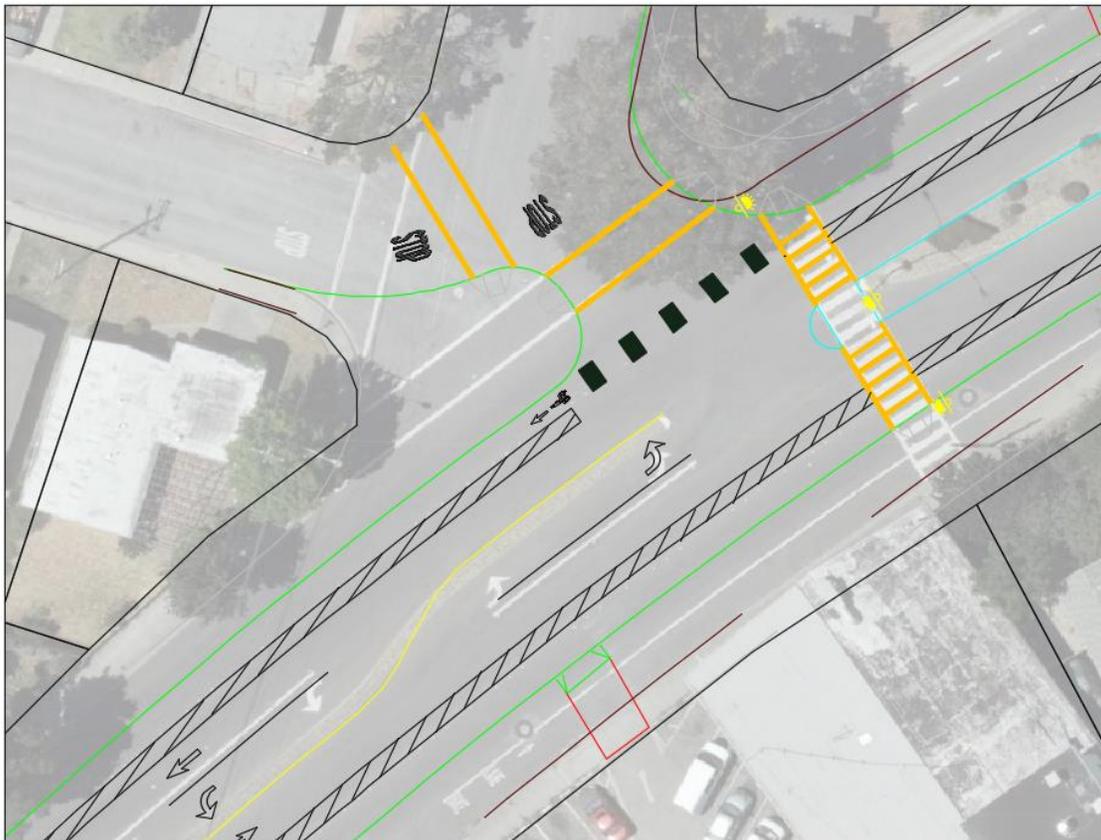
Rumrill Boulevard and Road 20 RRFBs
